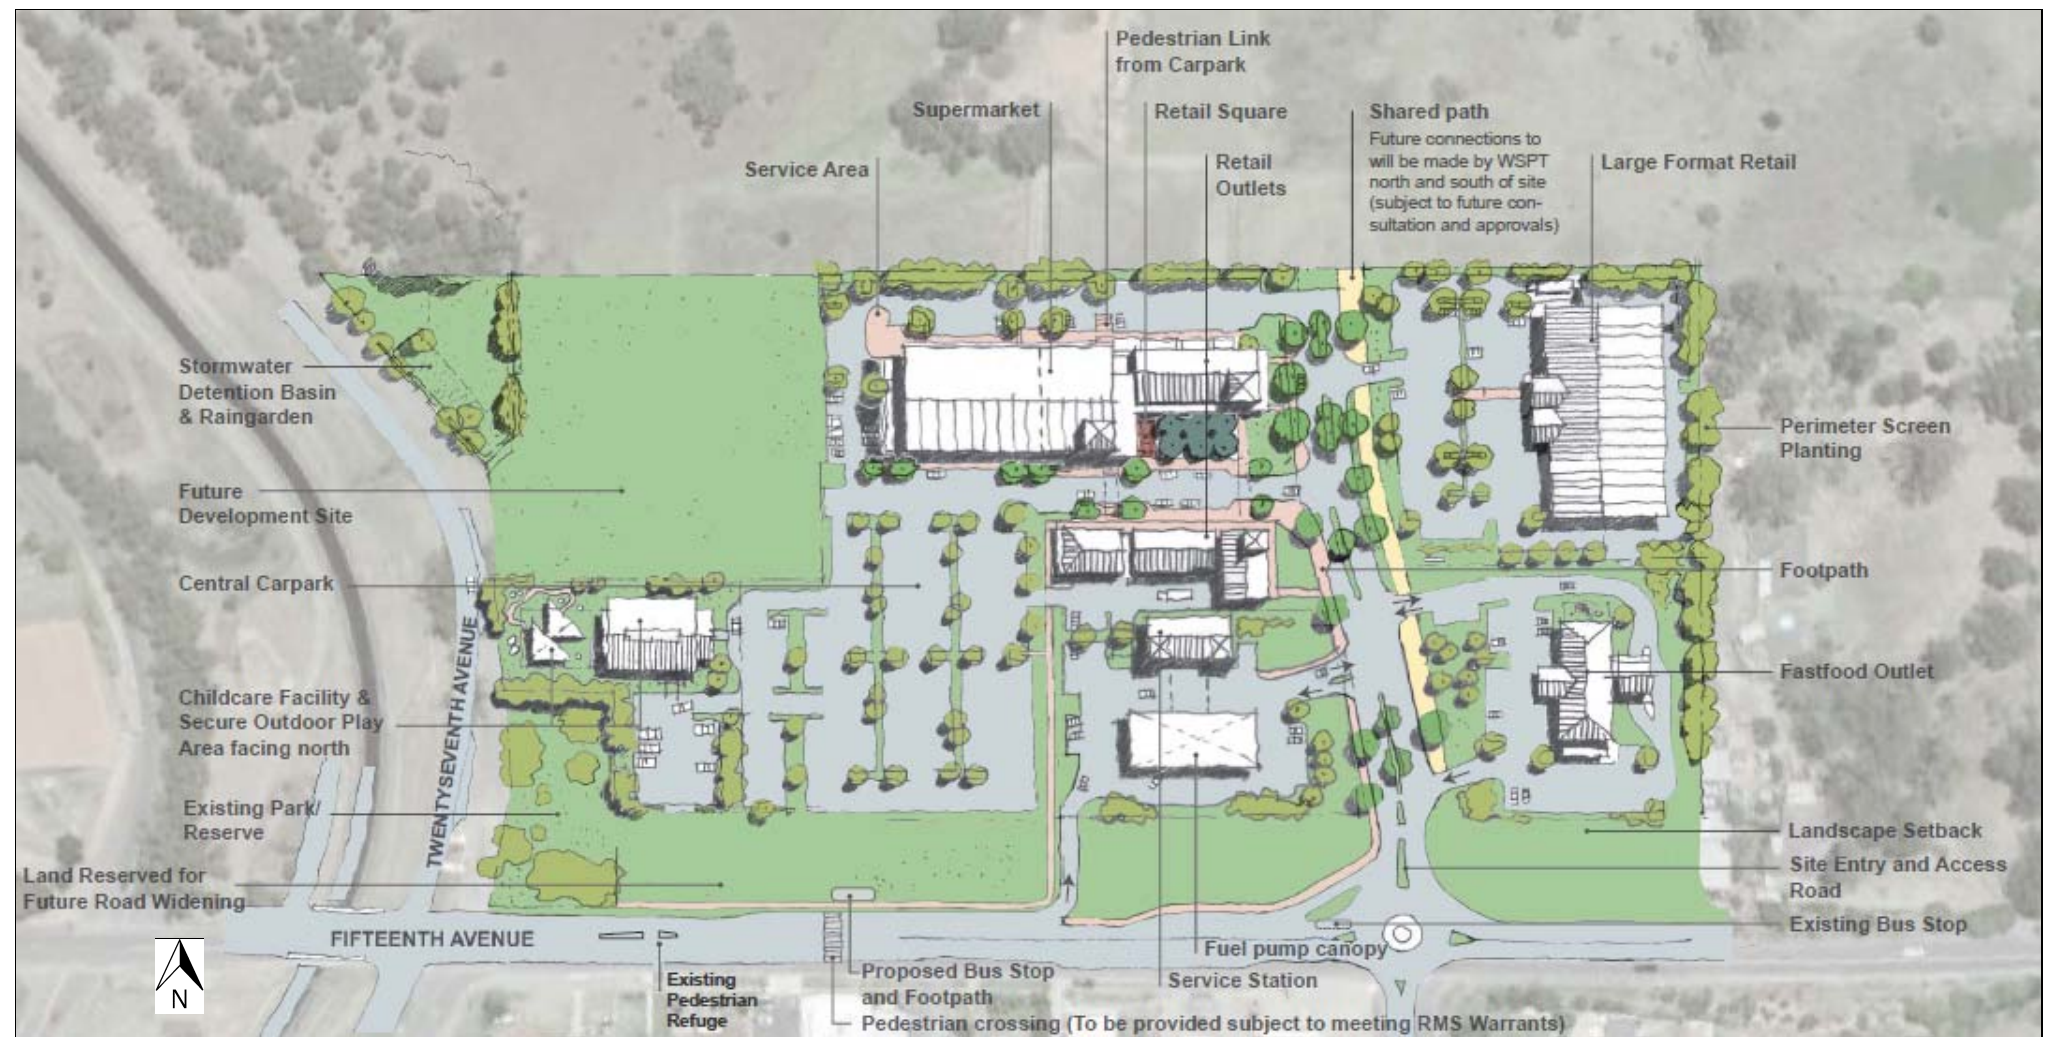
Development Site - Lot Layout and Indicative Building Envelopes
